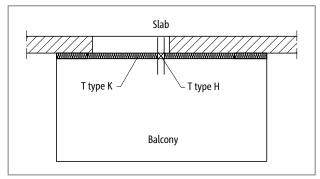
Schöck Isokorb® T type K: Balcony freely cantilevered, optional with T type H (from page 125) with planned horizontal loads, e.g. closed balustrades
